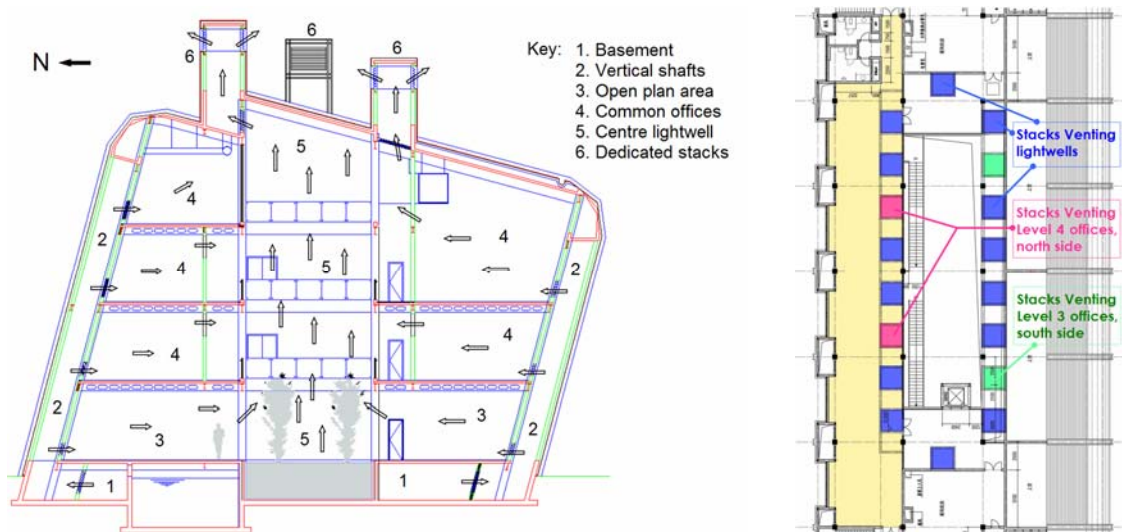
A section view with arrows showing airflow directions in NV mode (left) and roof plan view showing the stack locations and their functions (right).
